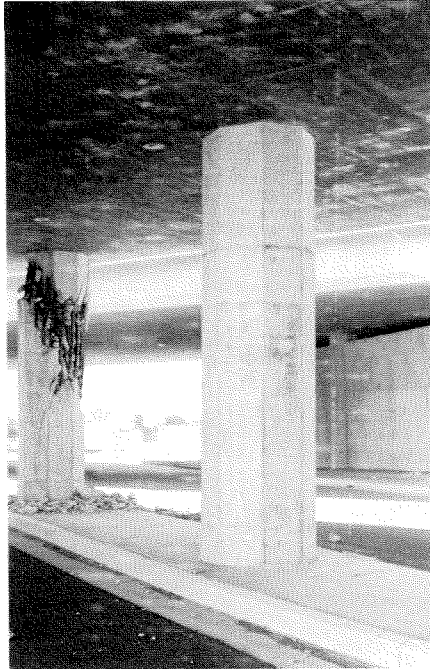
Failed columns of the southeastern bridge, Foothill Boulevard undercrossing, Foothill freeway.
